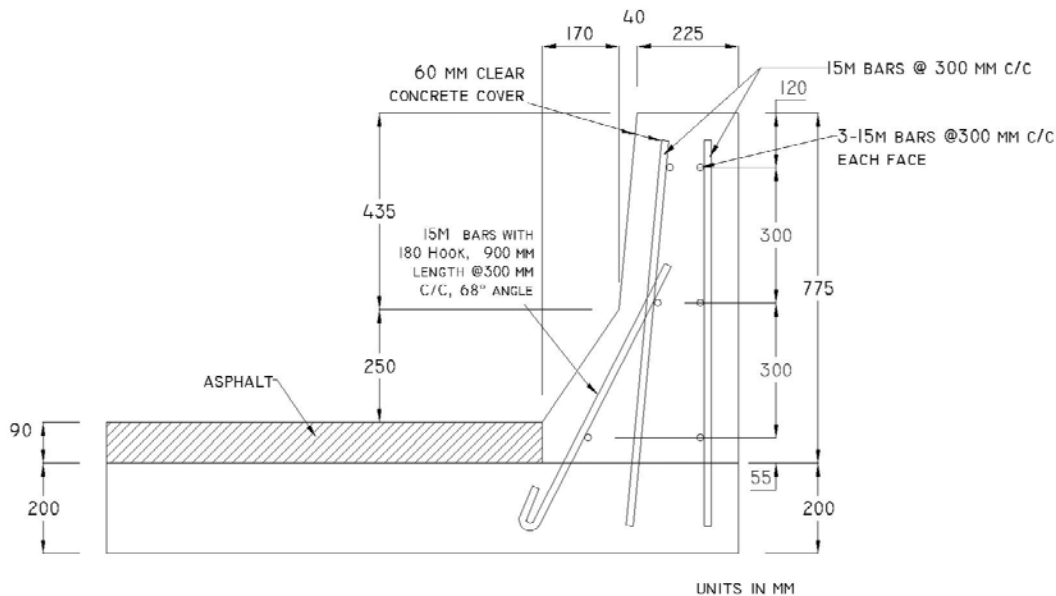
Design recommendation for TL-1/TL-2 concrete bridge barrier
